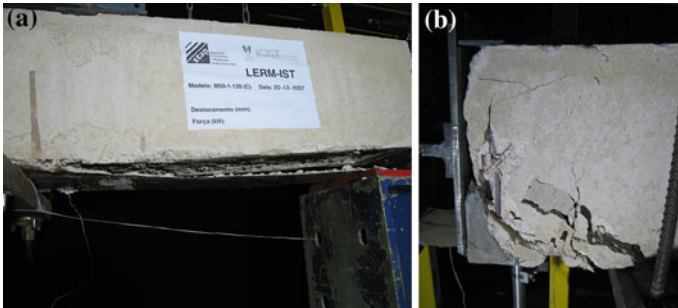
(a) GFRP debonding after the anchorage (A_2 Failure); (b) Masonry crushing (C Failure)
